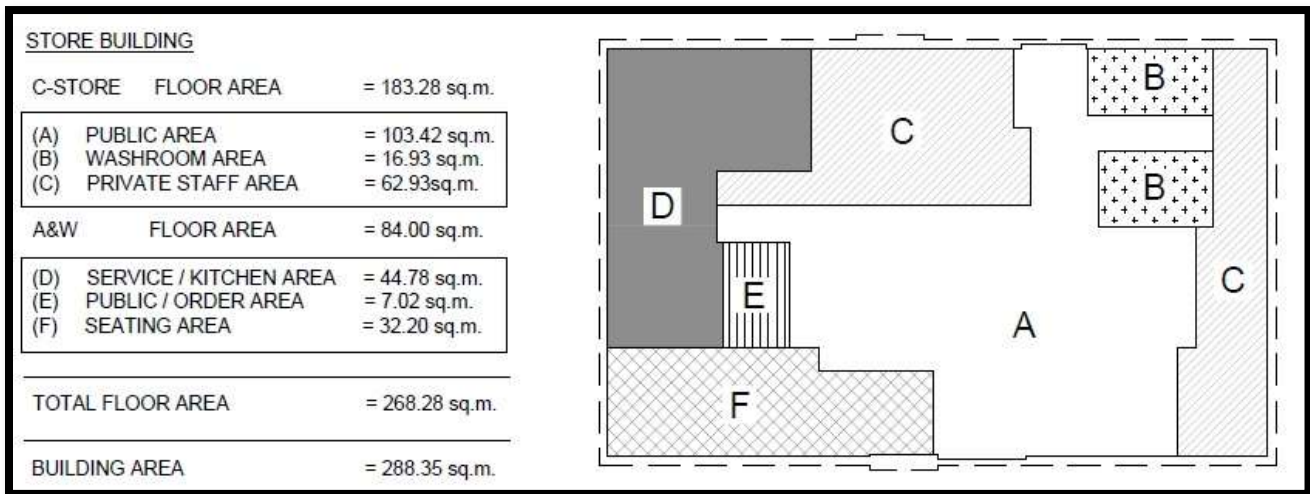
Exhibit H: Proposed Floor Plan of Building containing convenience store and A&W
